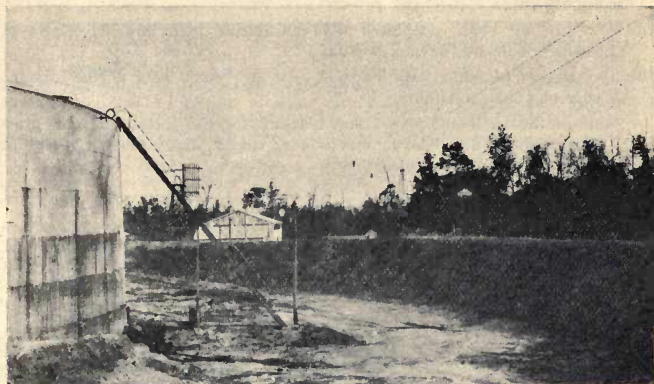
,000-Barrel Steel Tank on the Standard Oil Tank Farm. Shows Portion of Adequate Fire Wall which Centers the Tank in a Closed Basin.
